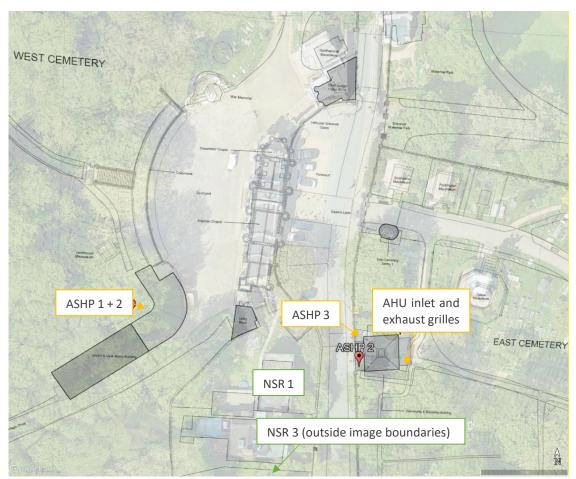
Aerial view with site plan overlay showing proposed locations of plant units to west side
